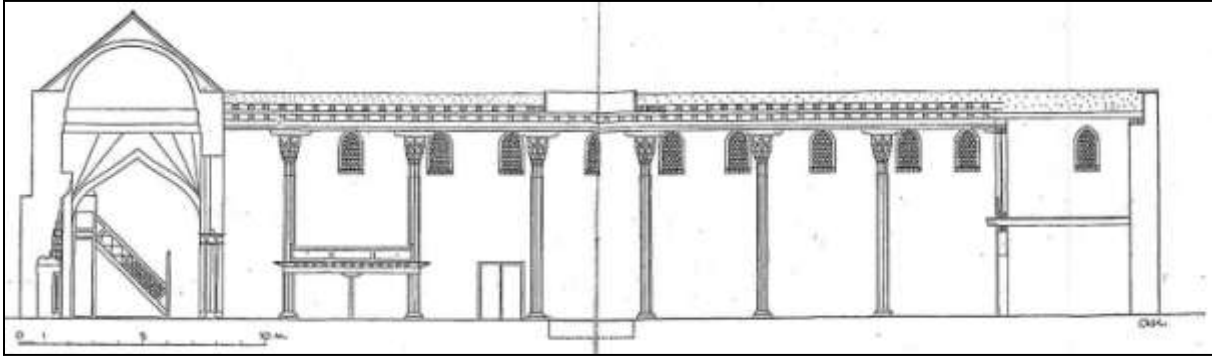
Application of Ceiling and Flat Roof in Beyşehir Eşrefoğlu Süleyman Bey Mosque Section
